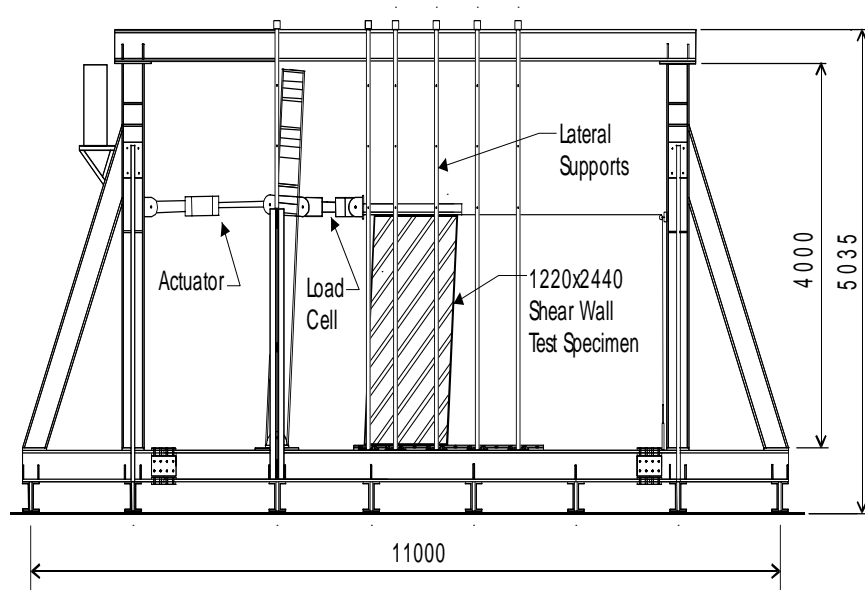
Schematic of test frame with 1220 × 2440 mm (4' × 8') wall specimen
